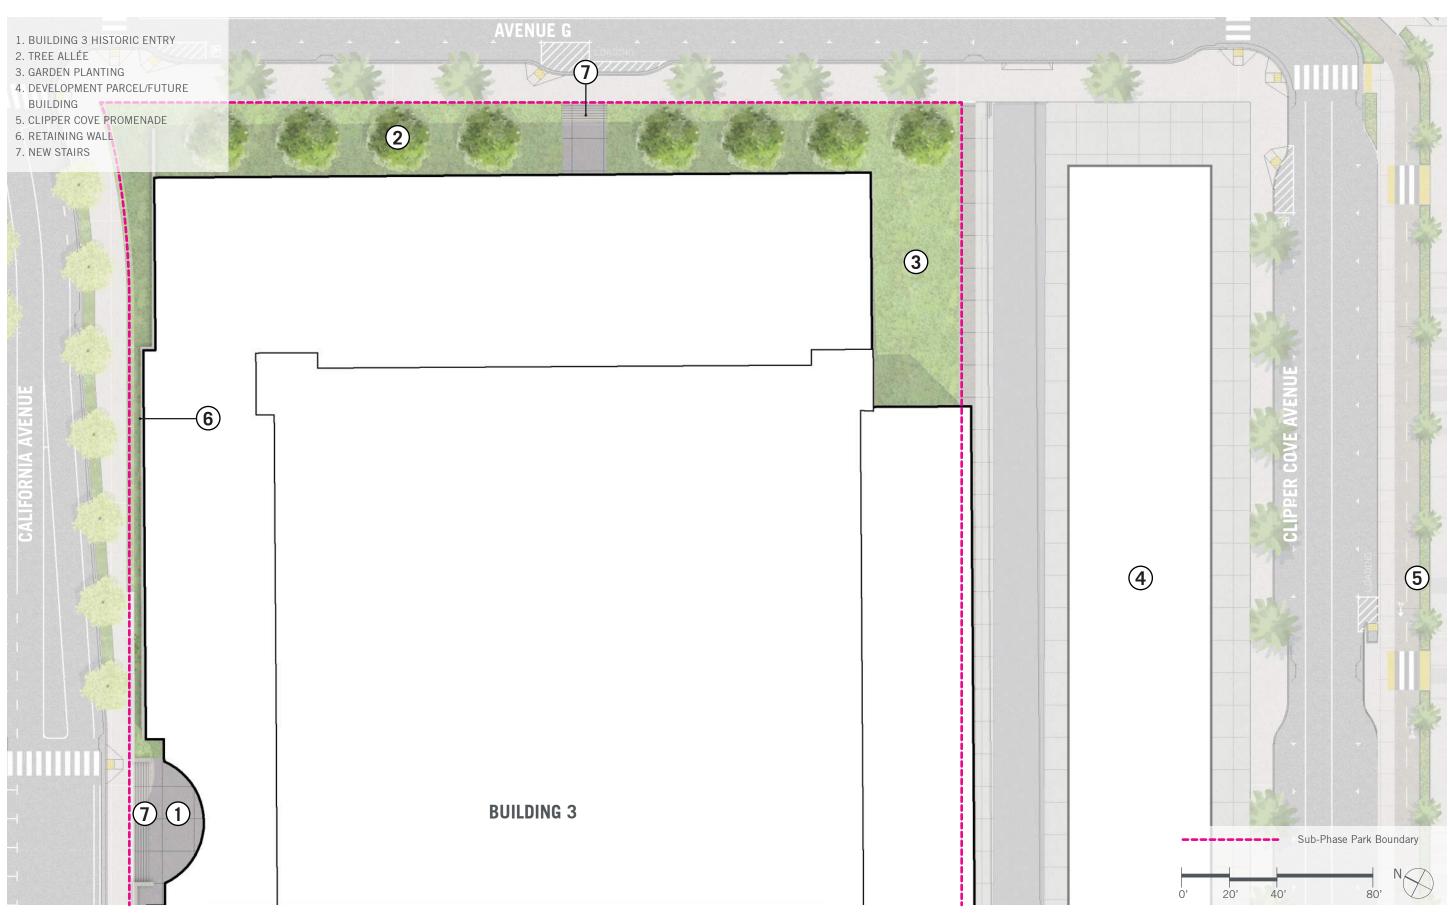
BUILDING 3 EAST SIDE OPEN SPACE ILLUSTRATIVE PLAN
